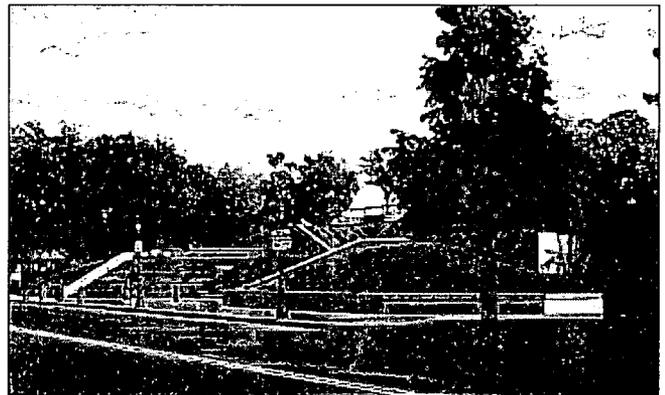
New Orleans Washington Artillery Park steps leading to levee embankment of the Mississippi River.
